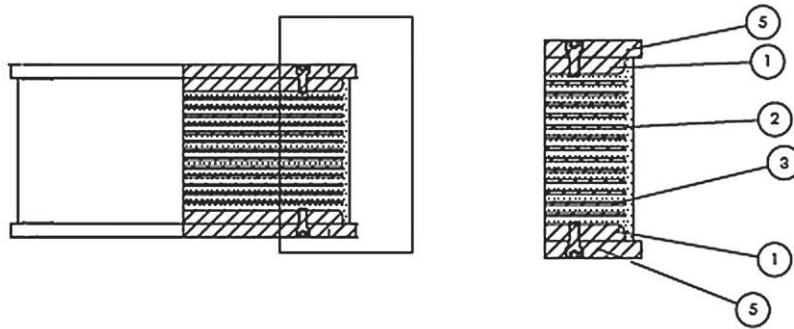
Sketch of the HDRD specimen, and cross-section details.
